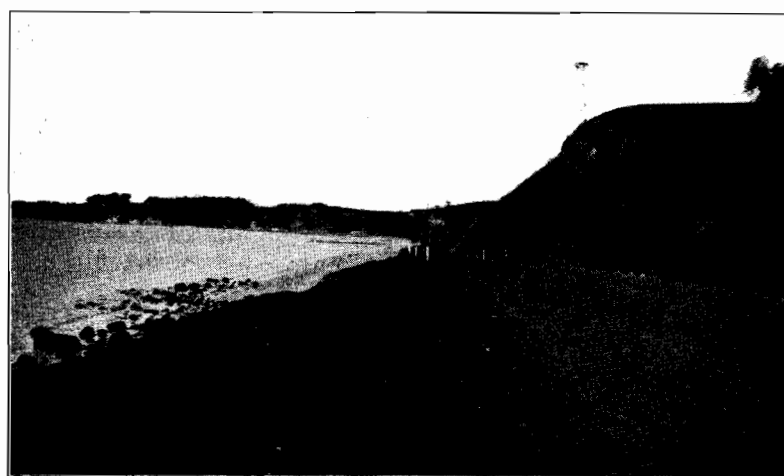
and 10.—Showing protective work on bank and formation carried out on the Cape Patterson–Eagles Nest Road.
